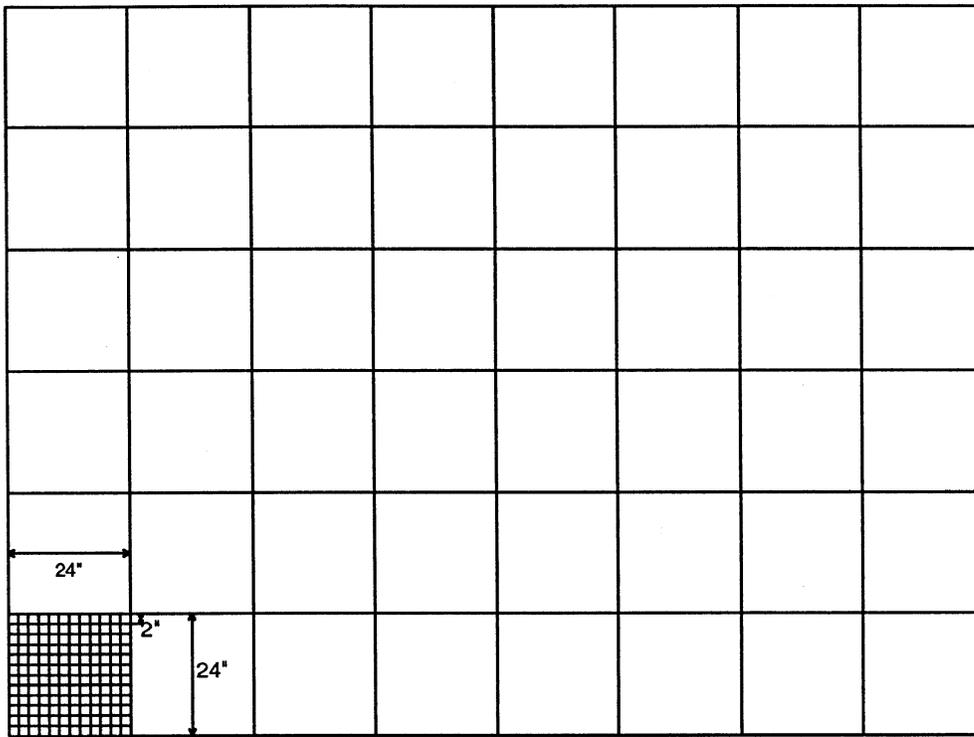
Floor Template — 24-Inch Tile (L472367)
